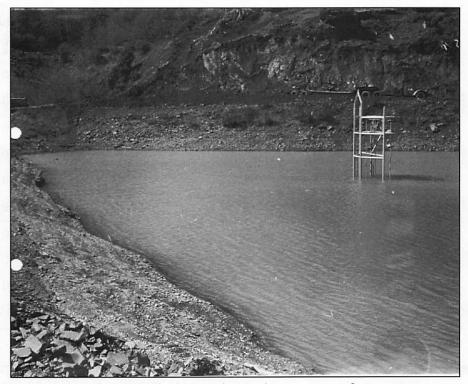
Historical photo from 1960 looking at the southwest corner of reservoir.
